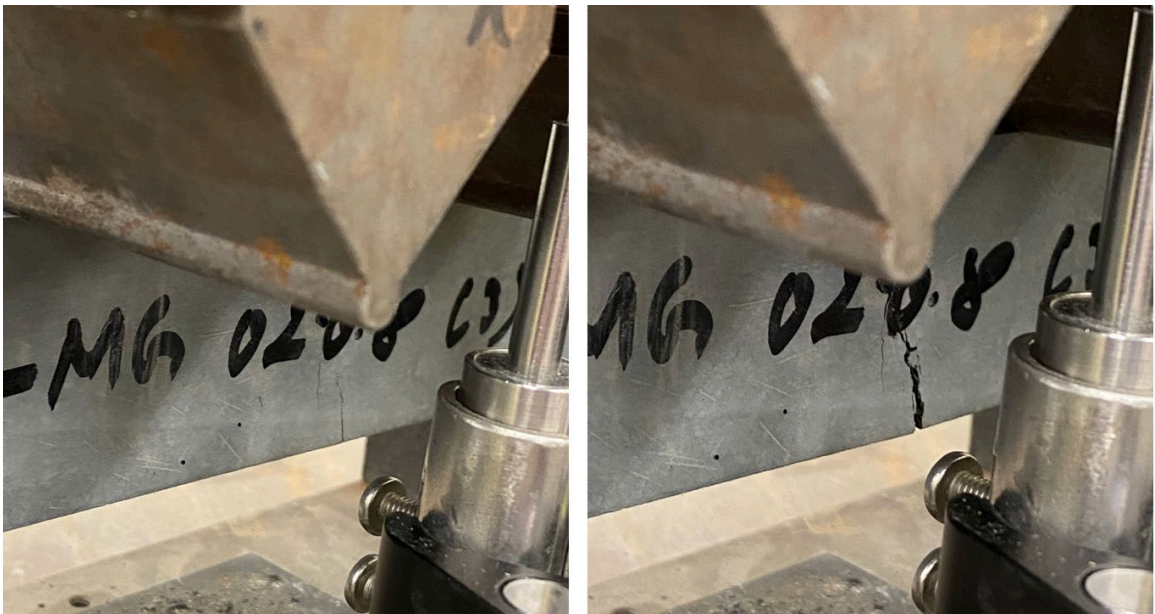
Formation of a major crack in a beam specimen during four-point bending test.
